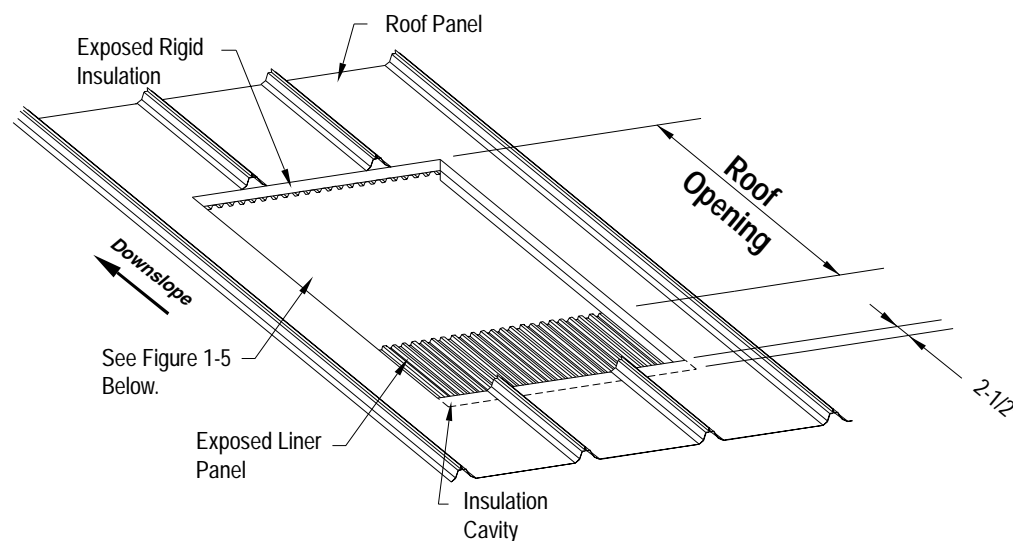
Insulation Board, Vapor Retardant and Liner Panel Cutout Detail.
